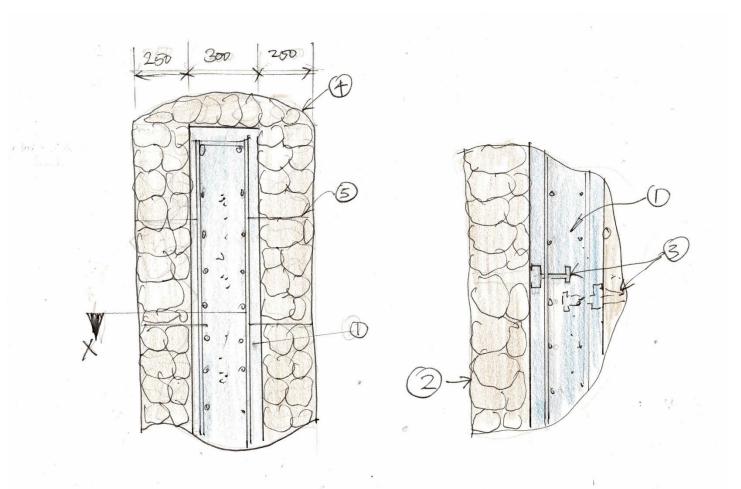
/SK C2 Shanganagh Bridge- Consolidation of piers and abutments
